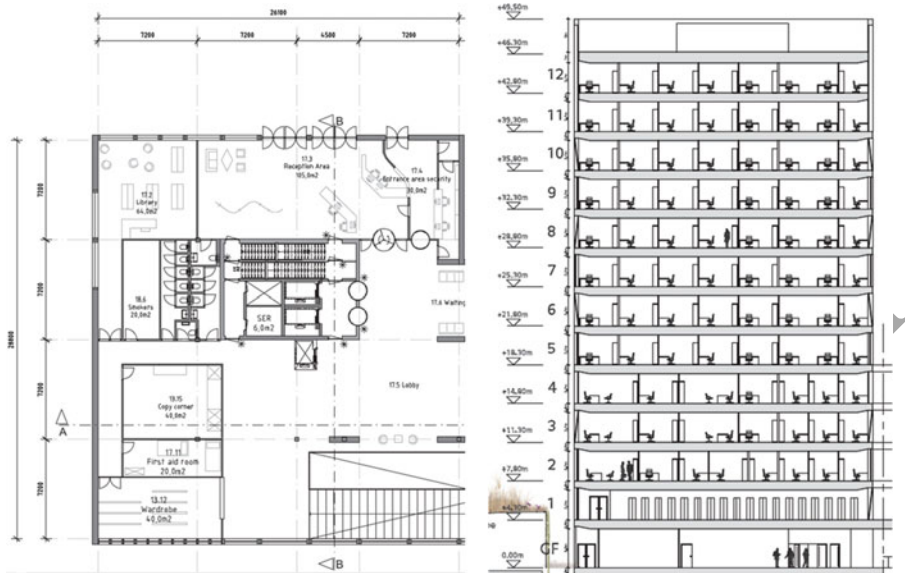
Dimensions of building tower: (a) plan and (b) section valuation parameters
